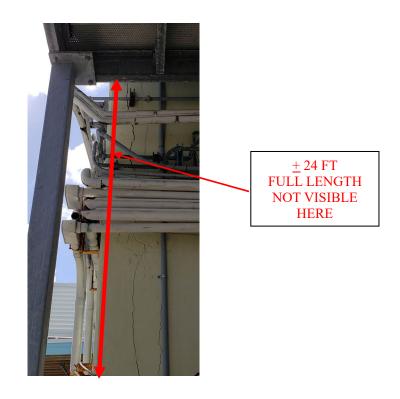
Location 18: Approximately 24 ft long new 16x8 concrete column. See detail 1/S101.
